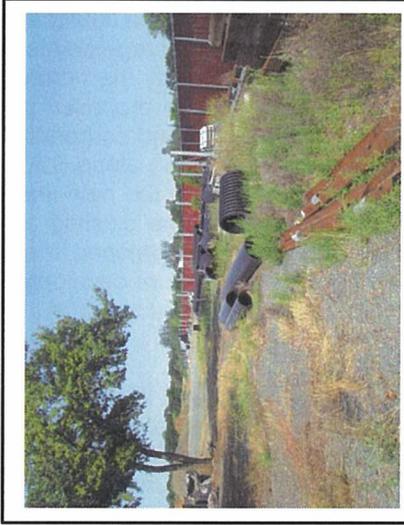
Existing County Public Works Department material storage in northeast portion of site adjacent to B Avenue.
